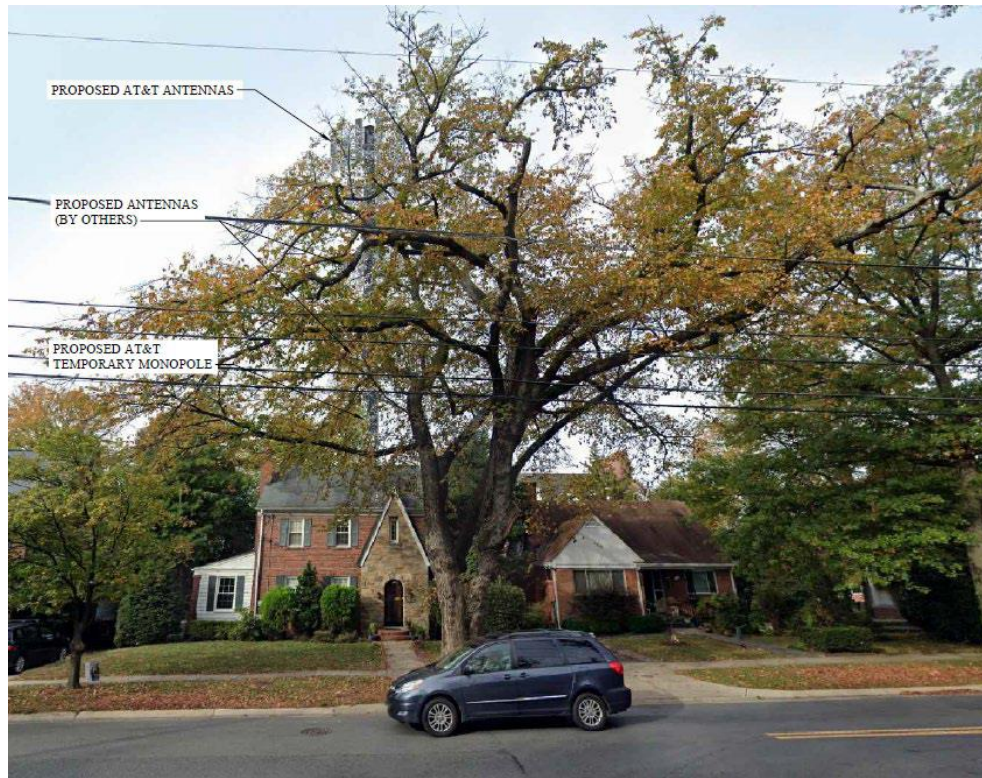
, p. 13, Figure 9: Eastern Elevation of Proposed Temporary Pole (From Second Avenue and Stratton Road)
